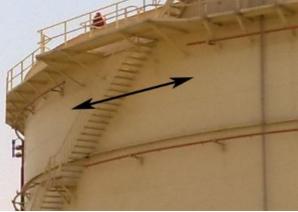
Dry Strips Above and Below the Stairway Due to Lack of Cooling Ring Main Around Stairway
